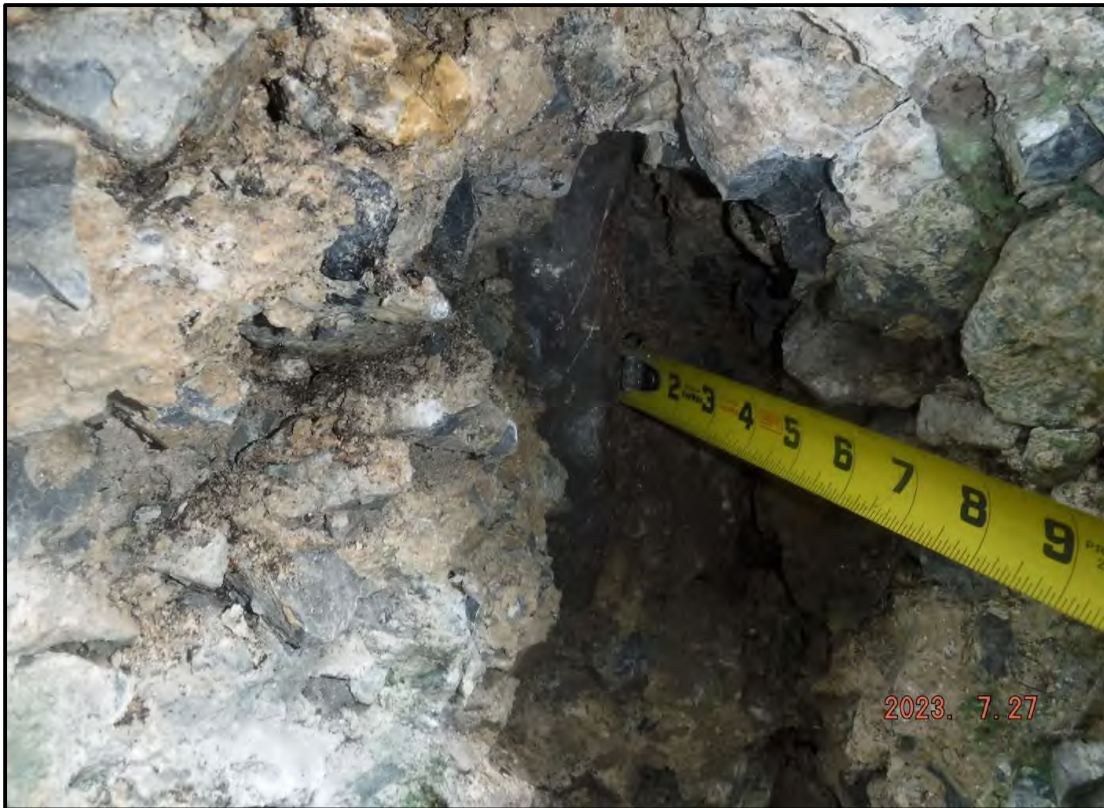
Spalled Concrete on Main Span Bent 2 North Pedestal
